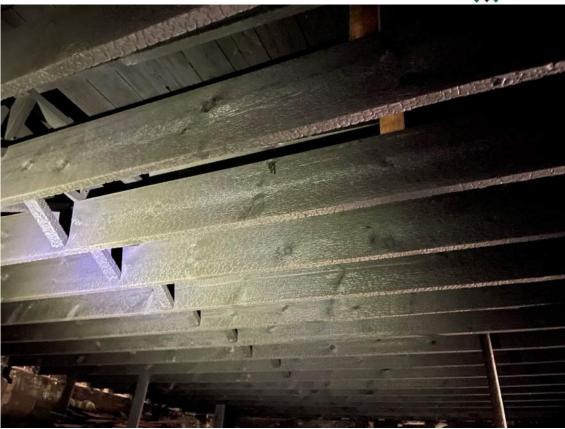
Existing roof joists that have been severely damaged due to fire.
